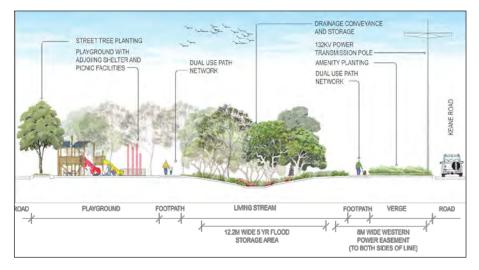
'Living Stream' Cross Section Source: Emerge Associates
